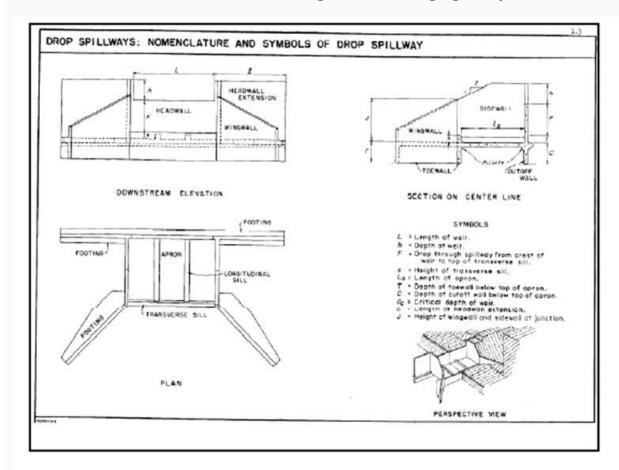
Drop structure. (Source: Singh et al. 1978)
